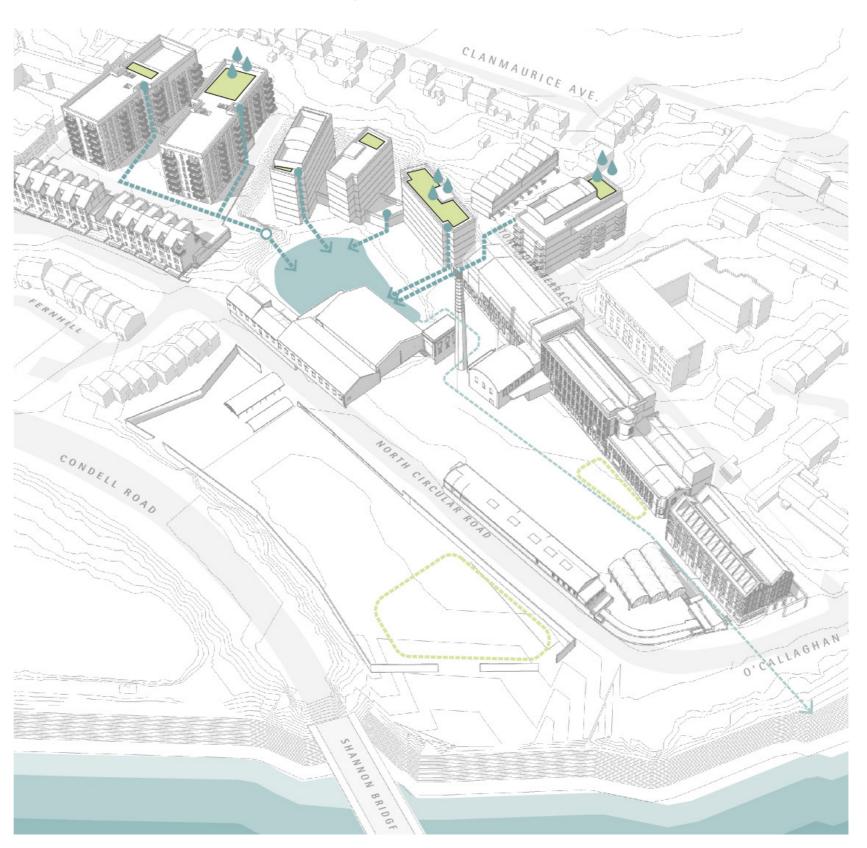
Blue-Green infrastructure strategy diagram. Refer to plan drawings and engineering reports for further details
